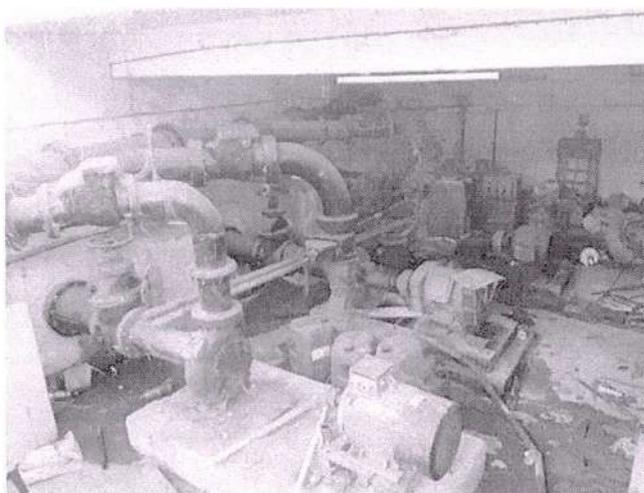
Pattoor sewage pumping station, pump not in working condition or scrab
